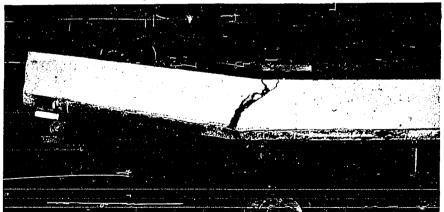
Typical shear-bond failure crack of beam constructed with steel deck G. Also showing end-slip
